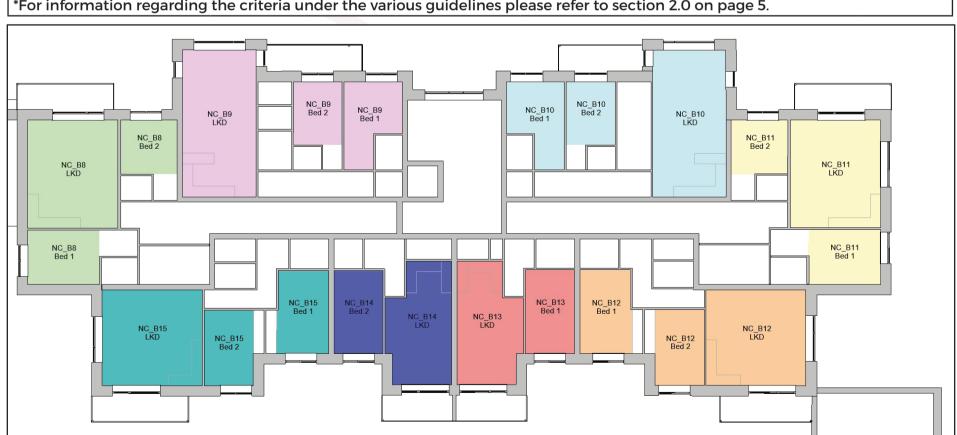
Floor plan of assessed building with keyplan highlighting the assessed building.
